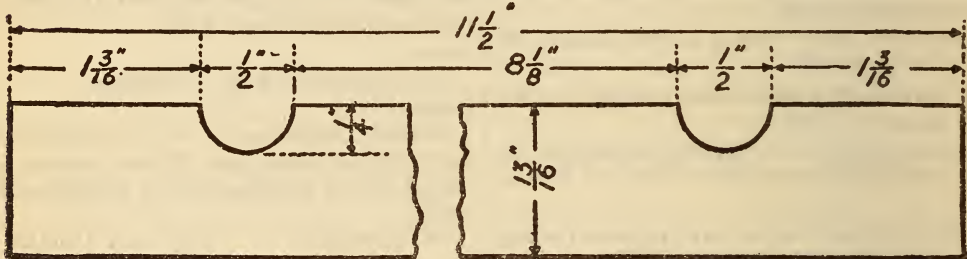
1 by 10 inch grooved roofing shall be worked 9 1/2-inch face; 1 by 12 inch grooved roofing shall be worked 11 1/2-inch face
